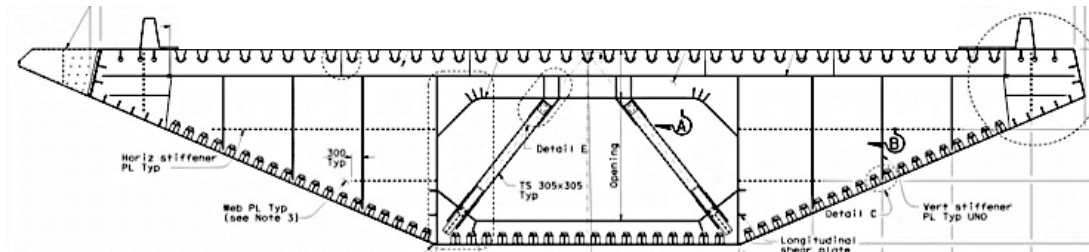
Typical floorbeam section (Ref.: Caltrans drawings 646/1204).
